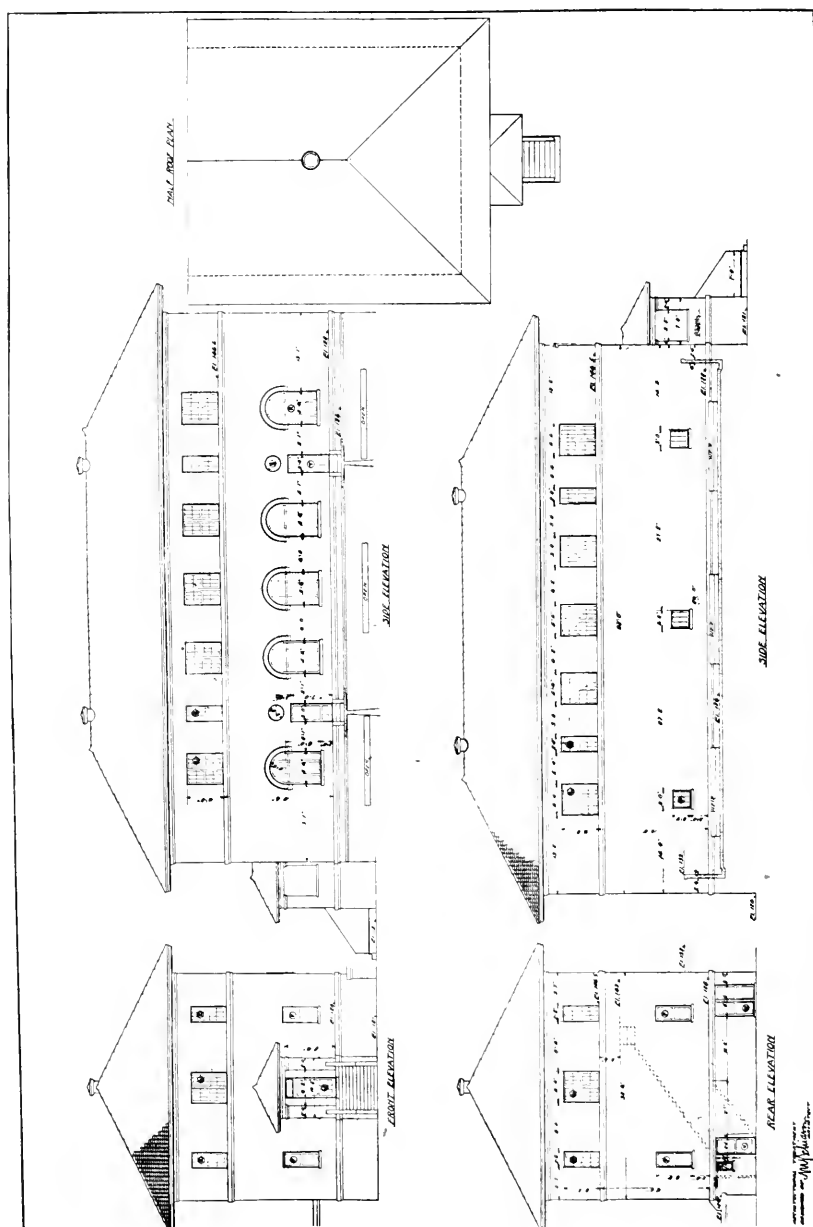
ELEVATIONS OF HEAD HOUSE.
